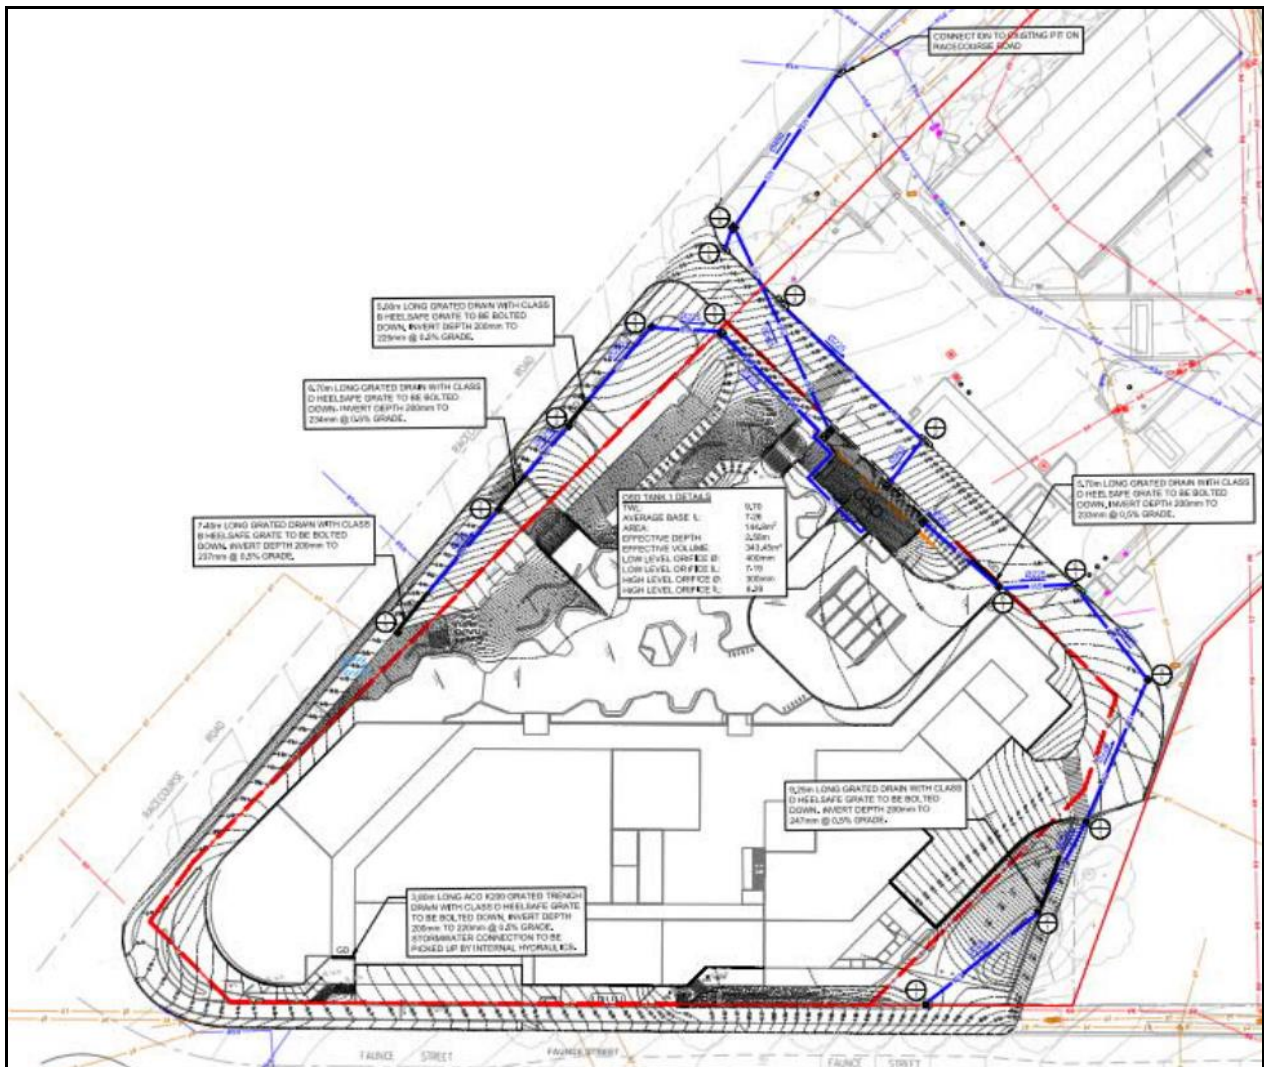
Extract of Proposed Stormwater Drainage Layout (WS+P, 2019)
